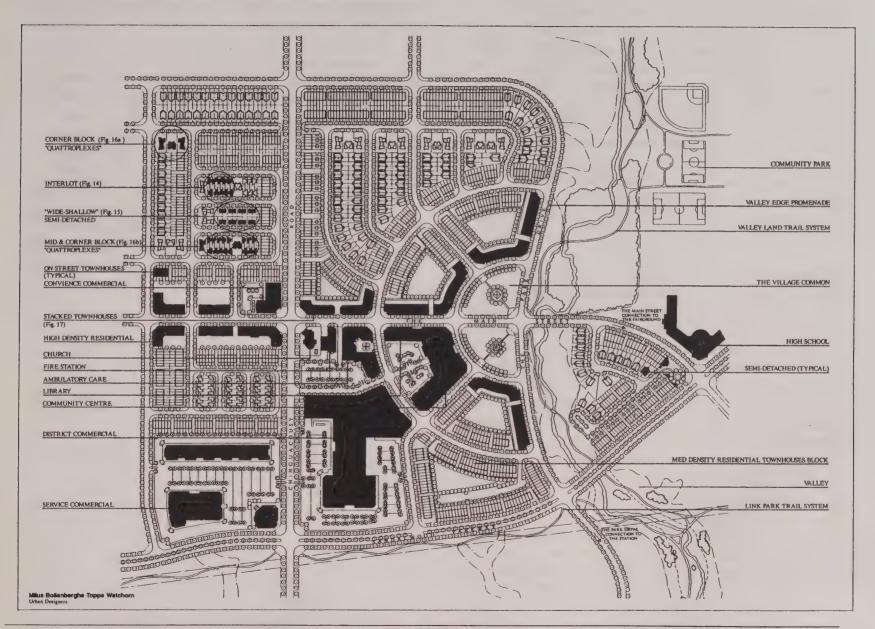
Fletchers Meadow, Brampton. Built Form Plan.
